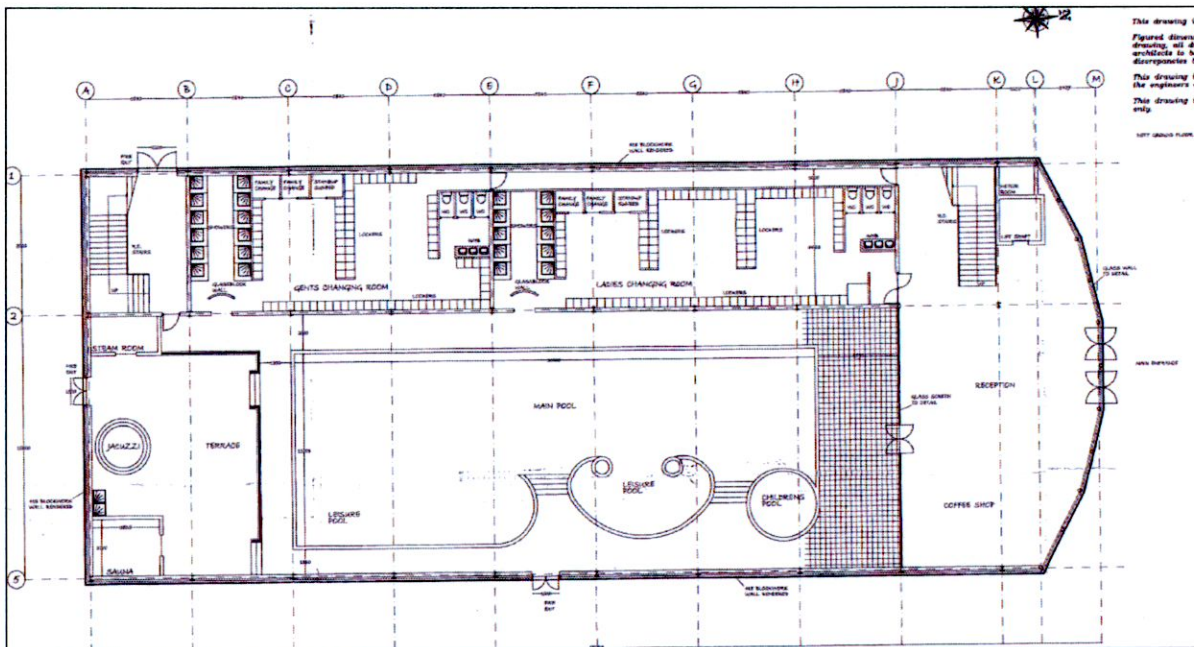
Ground floor plan granted under Reg. Ref. SD03A/0184.
